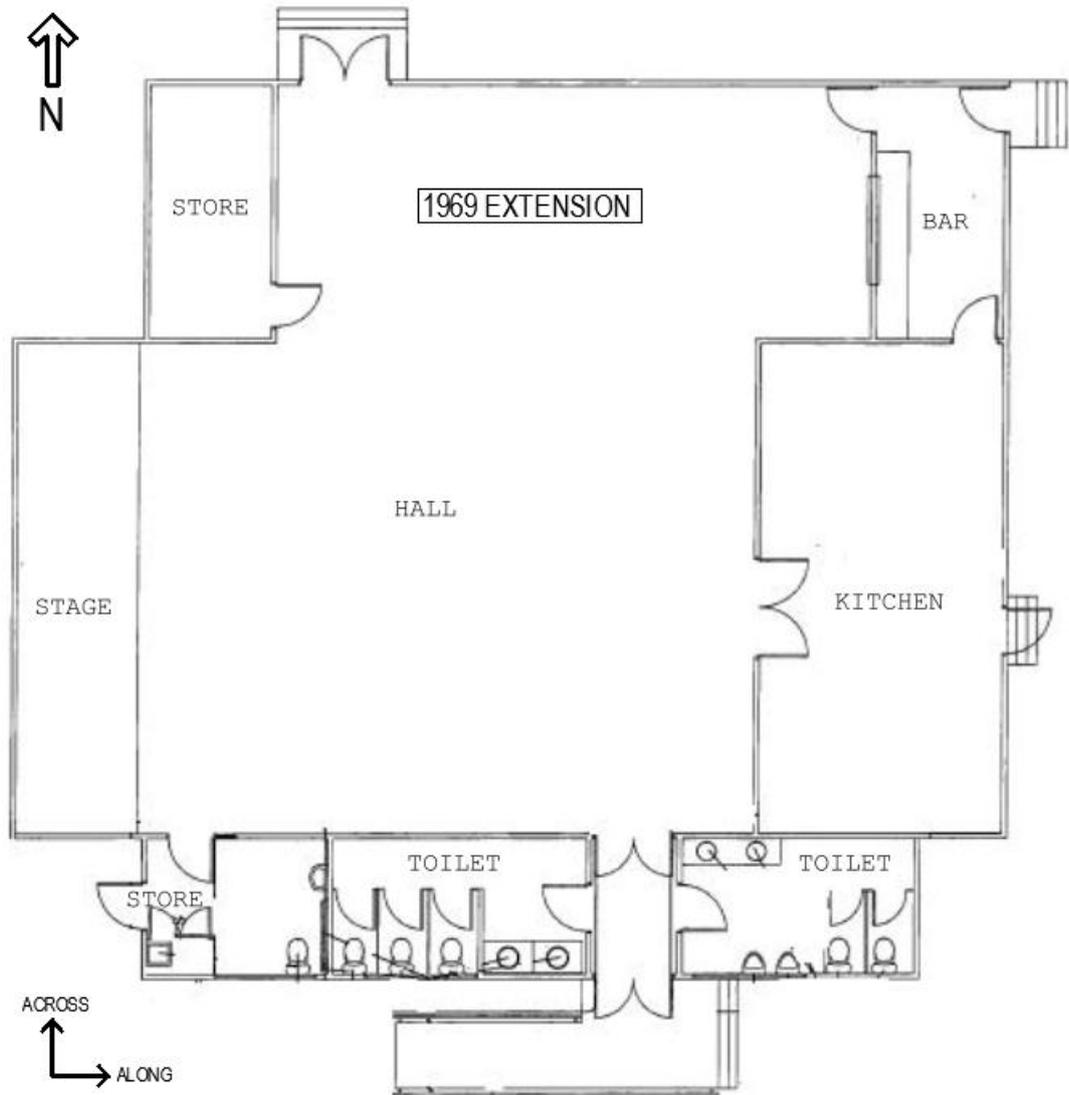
Plan Sketch Showing Main Hall, Hall Extension and Toilet as per 2010 Alterations
